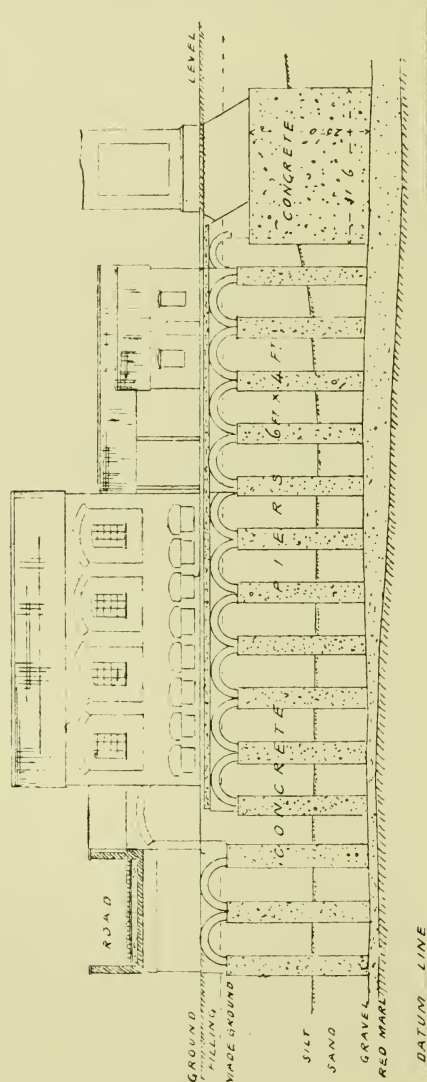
Longitudinal Section, showing Foundation Piers, &c.
